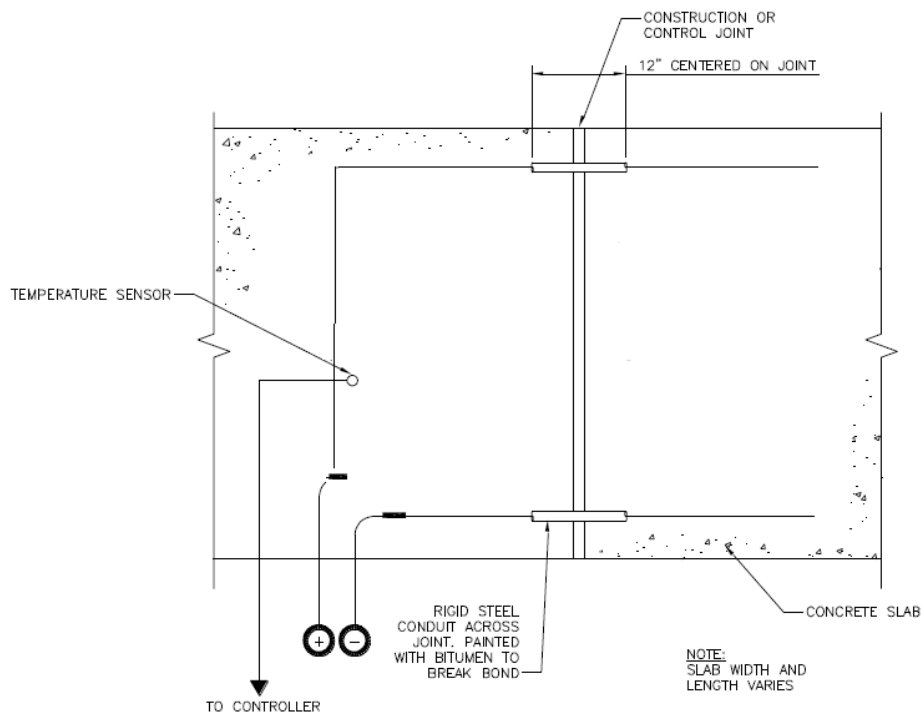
Electrical Wires Details at Joints (FAA, 2011)
